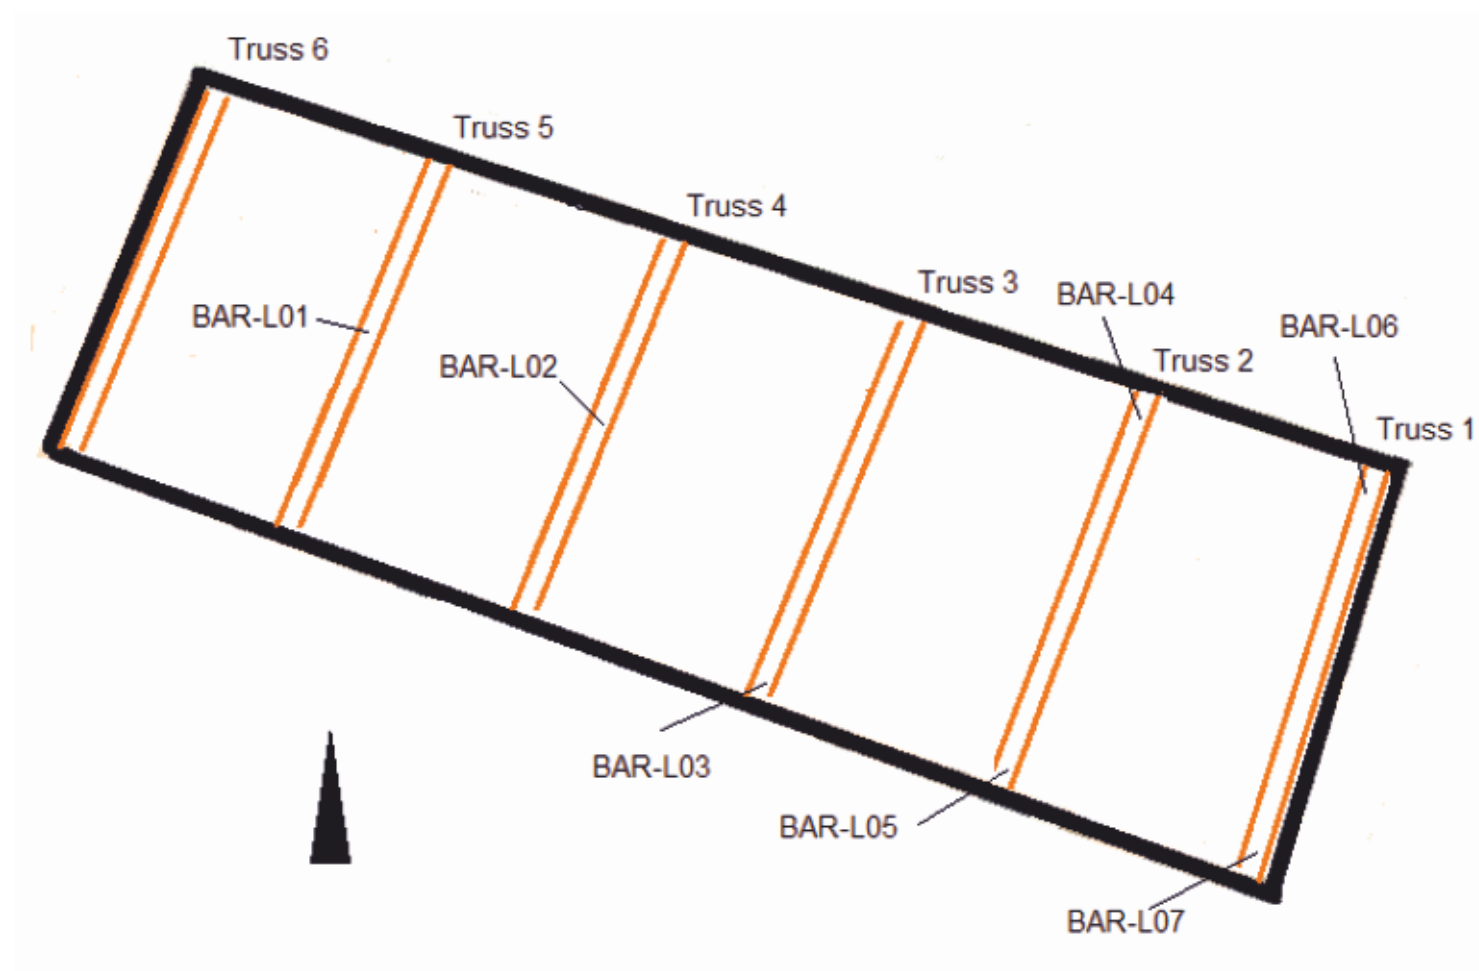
Sketch plan of Stables showing the location of samples BAR-L01–07
